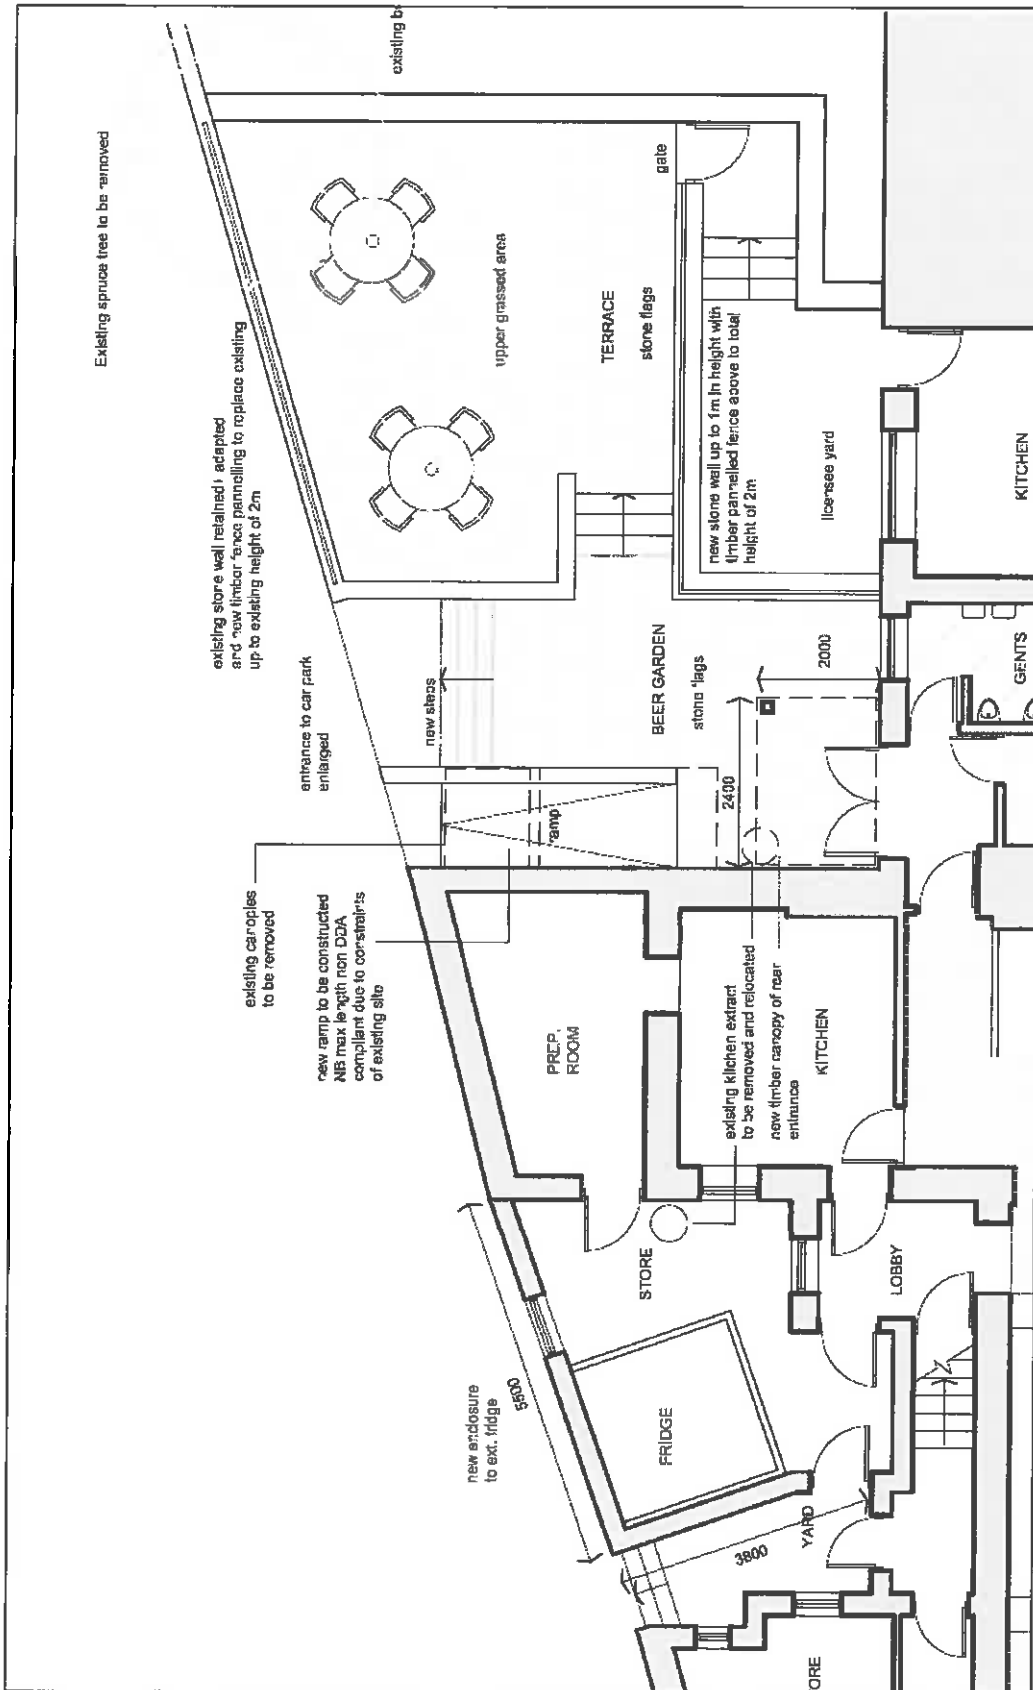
Extract of ground floor plan drawing (Fish Associates) showing proposed works
